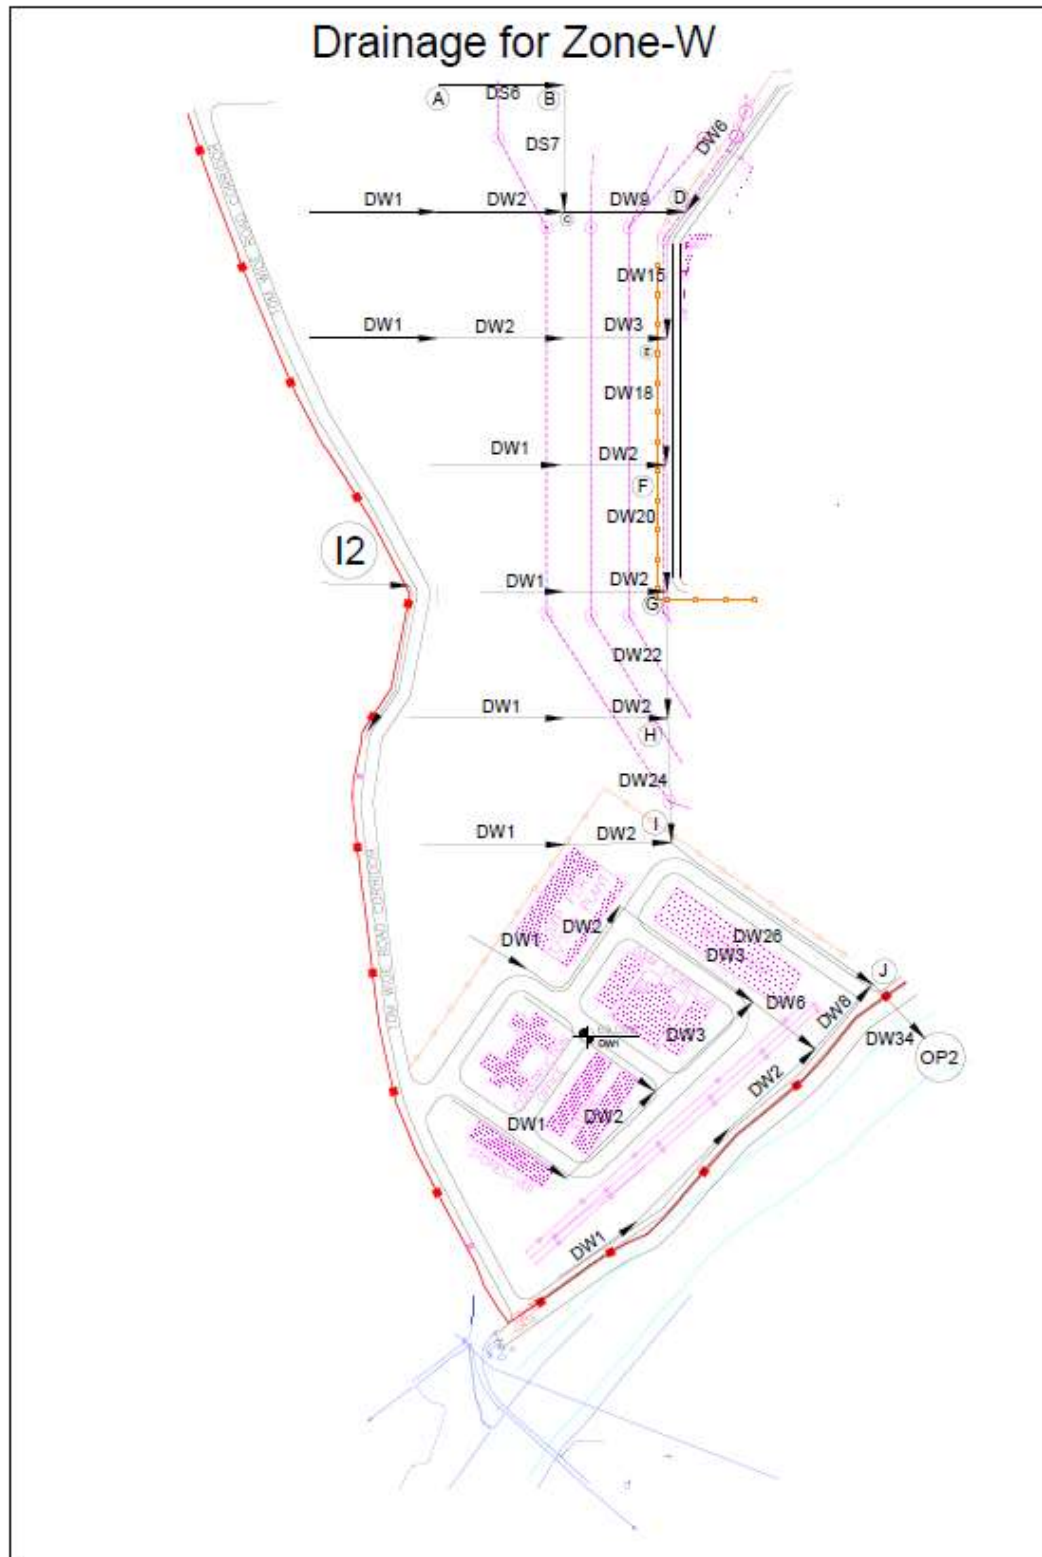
W Zone drainage plan showing drains, longest flow path and outfall location
